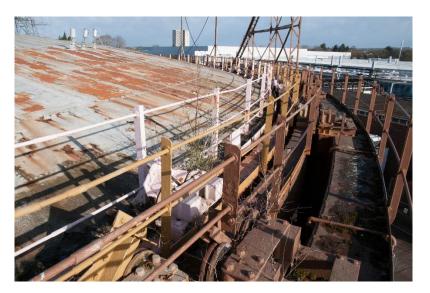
View of the crown, lifts and walkway, looking north from the east side of the gasholder
